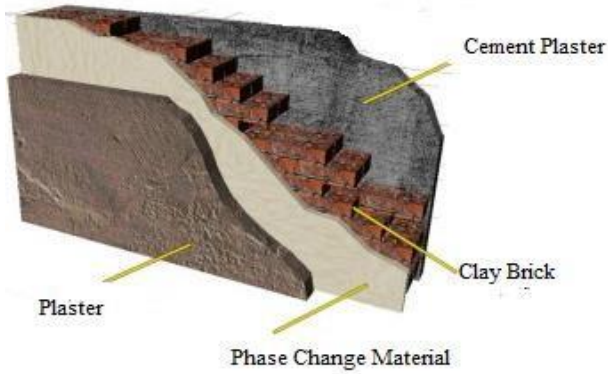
Wall Non-Conventional Construction of a Single Room Model[32]
